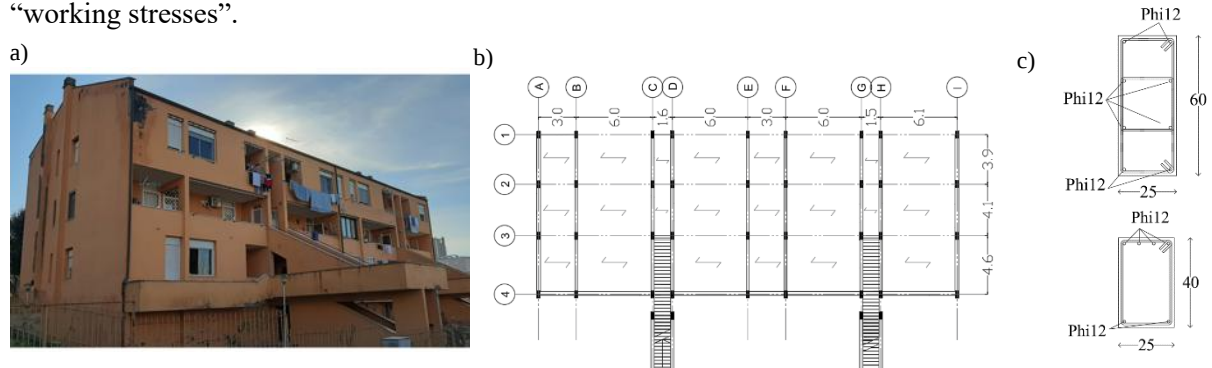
a) Case-study building, b) typical floor plan, c) beam and columns cross-sectional area properties and reinforcement
